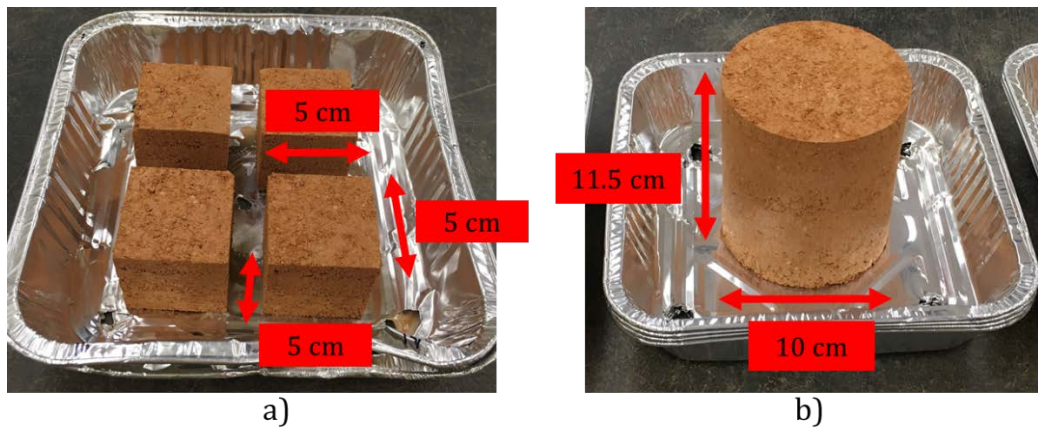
Testing specimens for a) unconfined compression test, b) durability test
